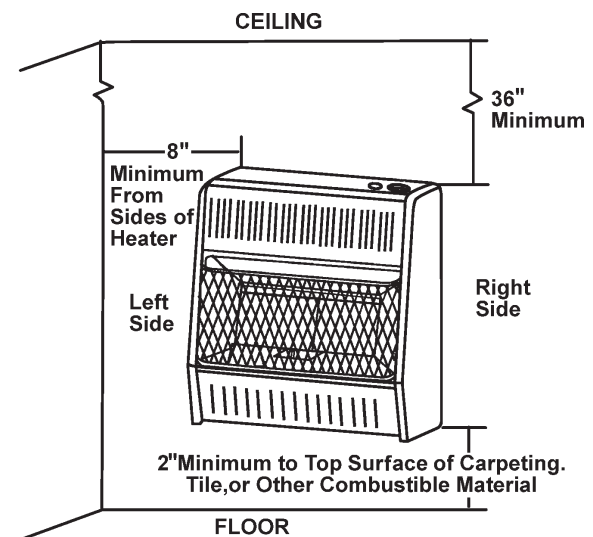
Mounting clearances as viewed from front of heater (inches)
